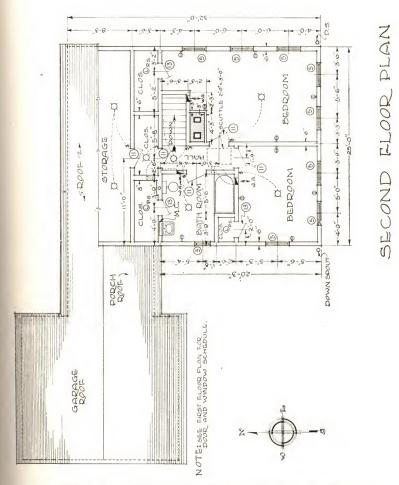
B, Plate 2. Second-Floor Plan of House Shown in Fig. 73A, After Remodeling
